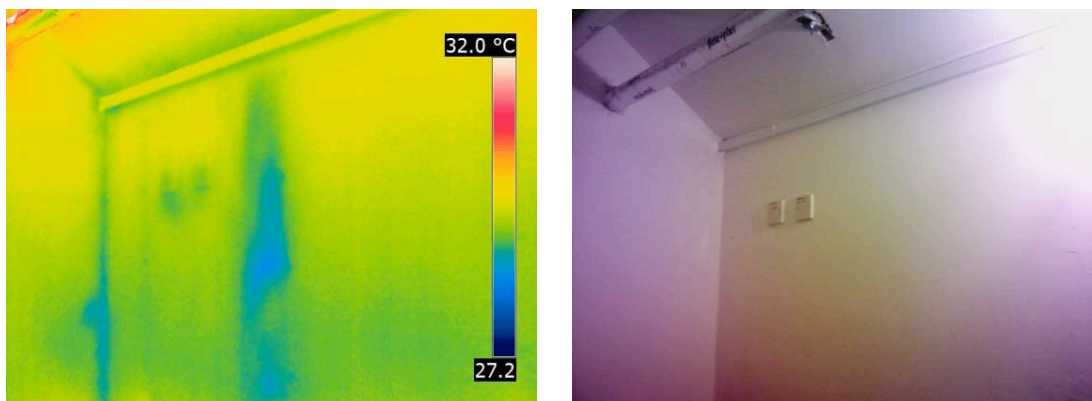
Spot on the partition wall between the bedroom and bathroom in dwelling 2.
